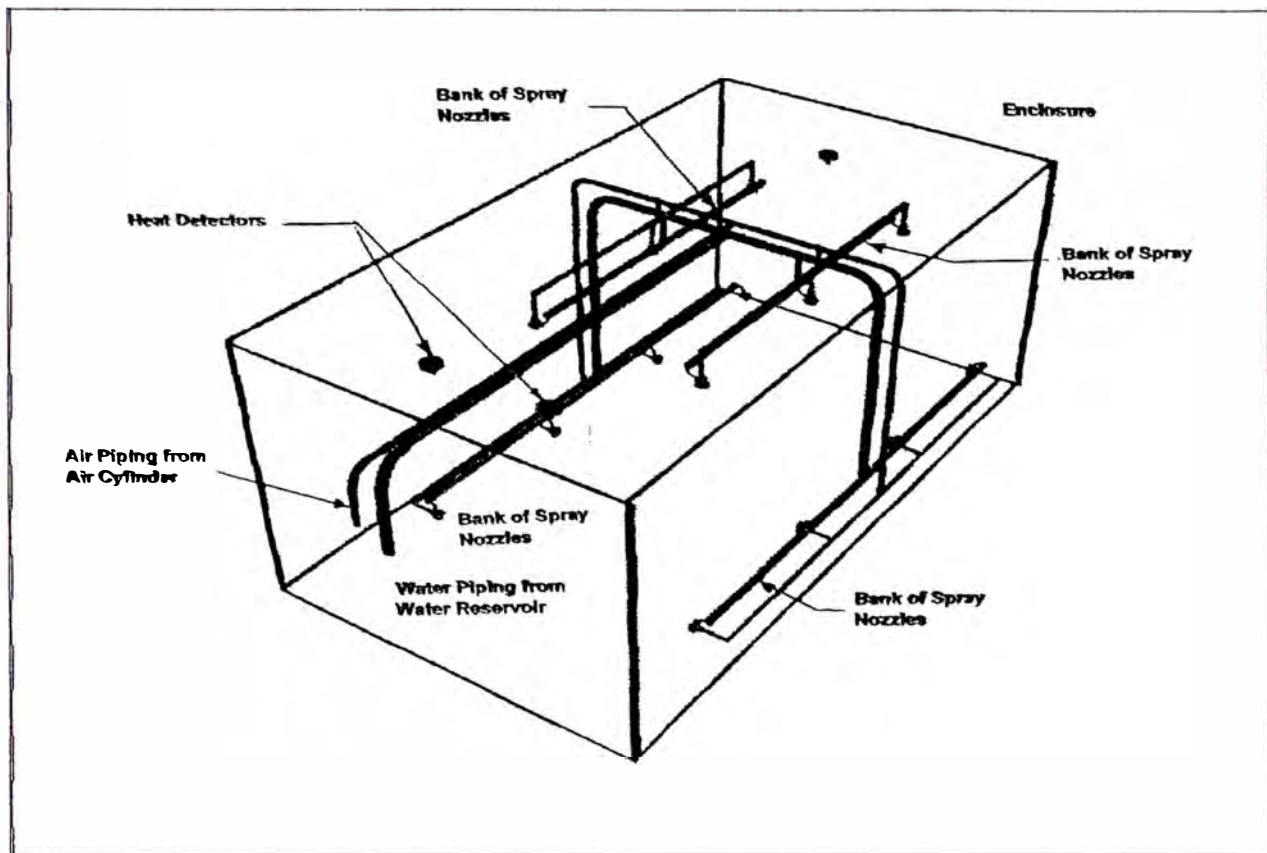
Layout of heat detectors, air and water piping, and nozzles for one type of water mist system.
